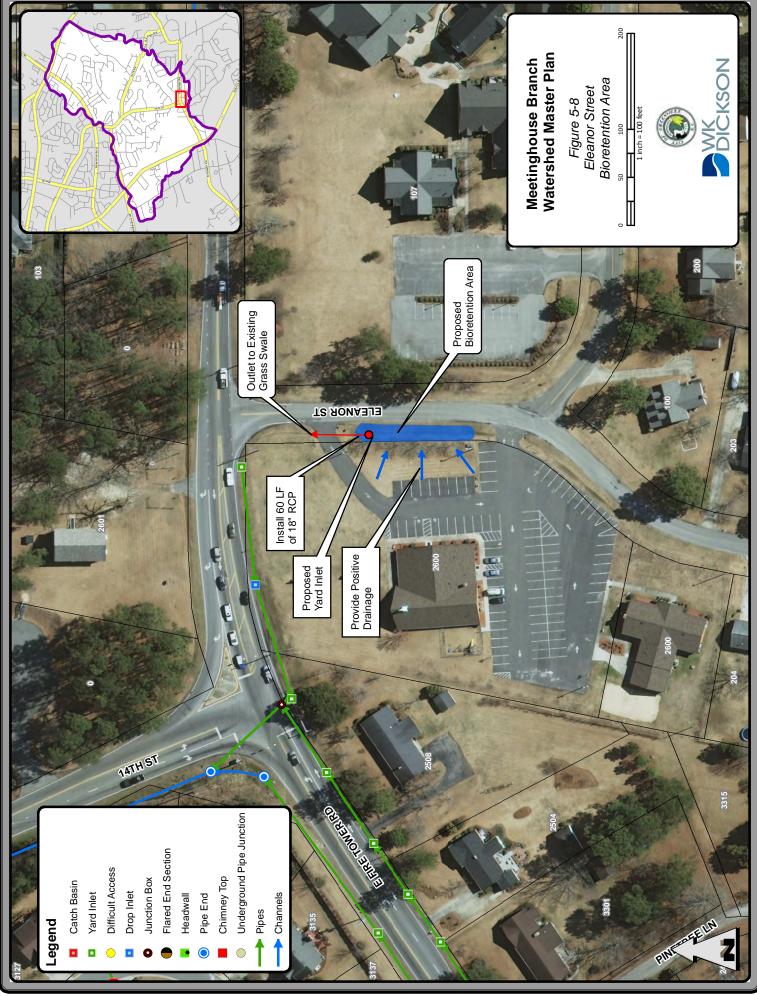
Proposed Location for Eleanor Street Bioretention Area (Source: Google Earth)
